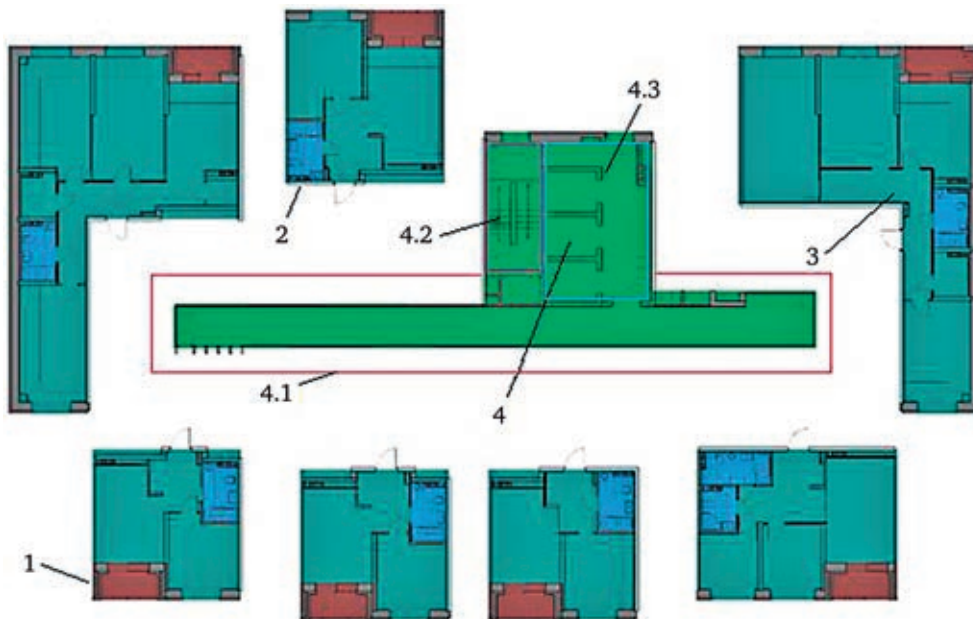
Elements of the BIM module library that make up a typical floor plan: 1 — loggia module; 2 — bathroom module; 3 — apartment module; 4 — staircase and elevator unit module; 4.1 — inter-apartment corridor as part of staircase and elevator unit module; 4.2 — stairwell as part of staircase and elevator unit module; 4.3 — elevator hall with elevator shafts as part of staircase and elevator unit module
